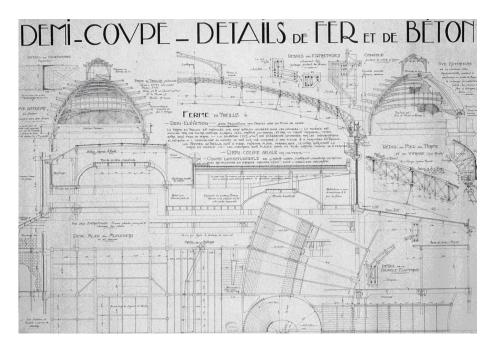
Vitale, "concours de construction générale" 1922: a panorama. Half-section, concrete and iron details (BENSBA, CG 360)
